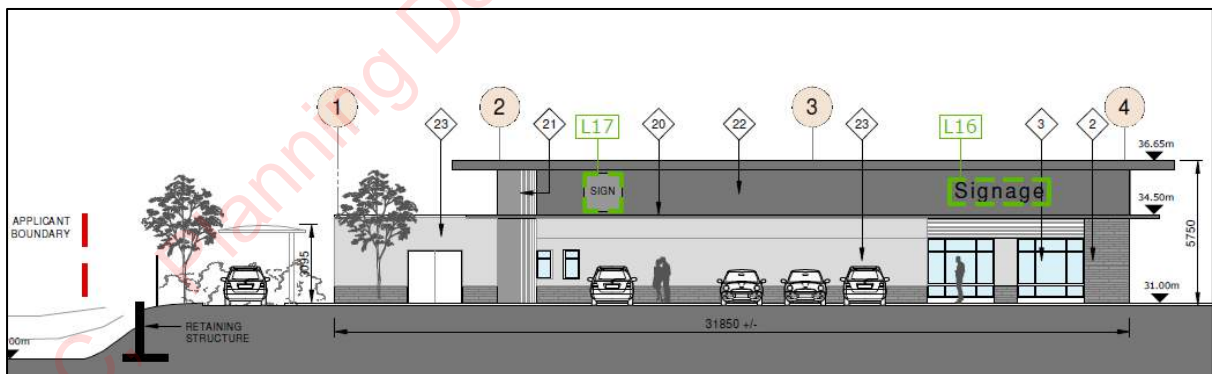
South elevation of the proposed Drive-Thru unit (Phase 3).
